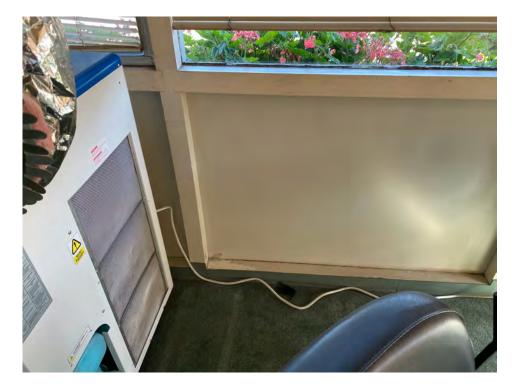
Gray 9" x 9" Floor Tile (Under Carpet & Sheet Flooring)-2515 Main St.- CCHD Office Area- ACM
